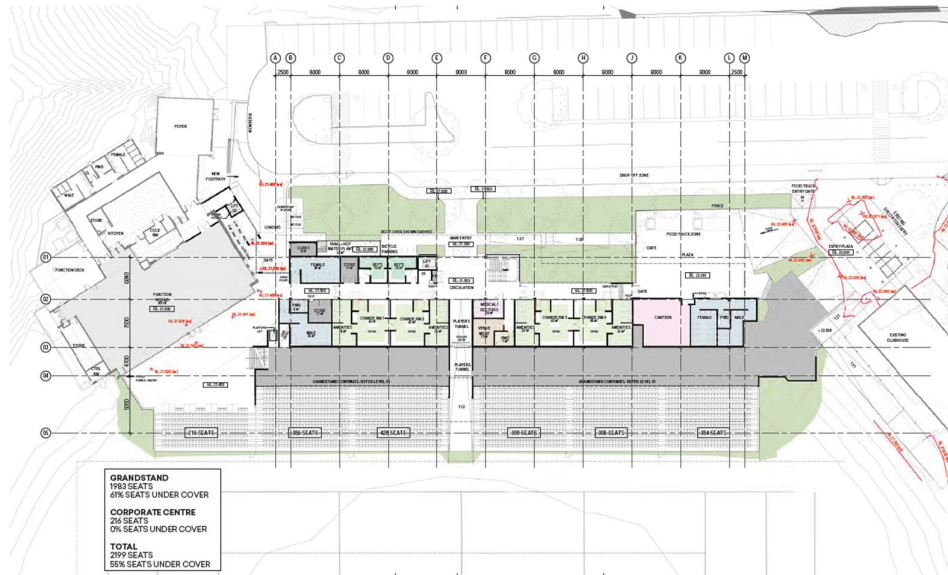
Proposed ground level layout (Source: Blight Rayner, 2026)
